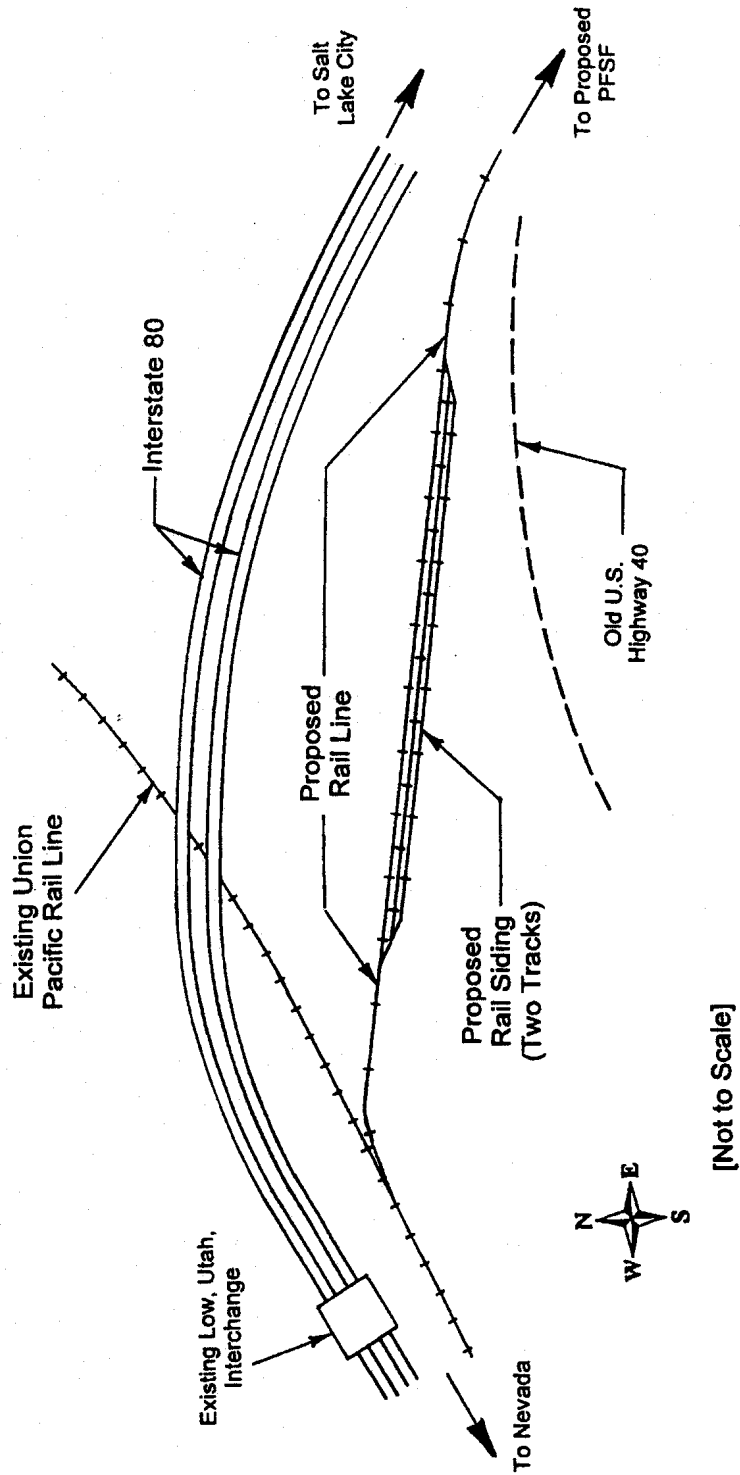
Basic site plan and layout for the proposed rail siding near Skunk Ridge, Utah.
